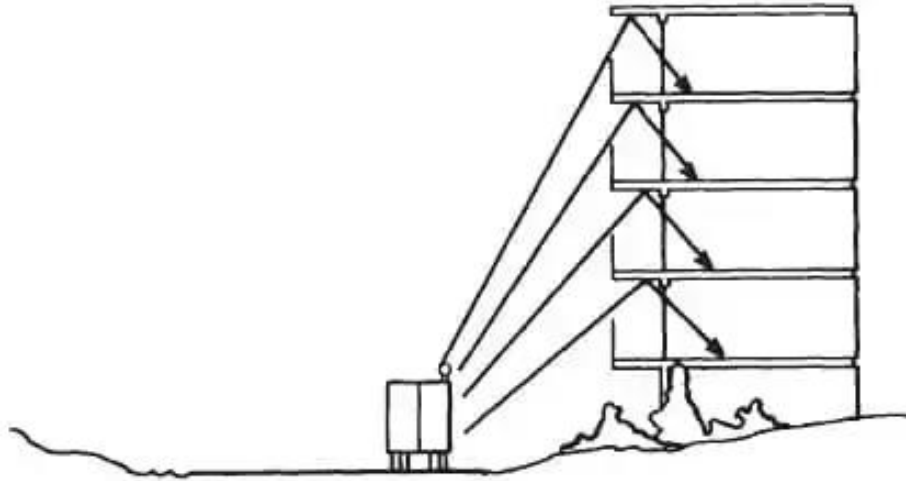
Balcony Facing the Road attracts Noise into the Building (K, 2009-2021)
